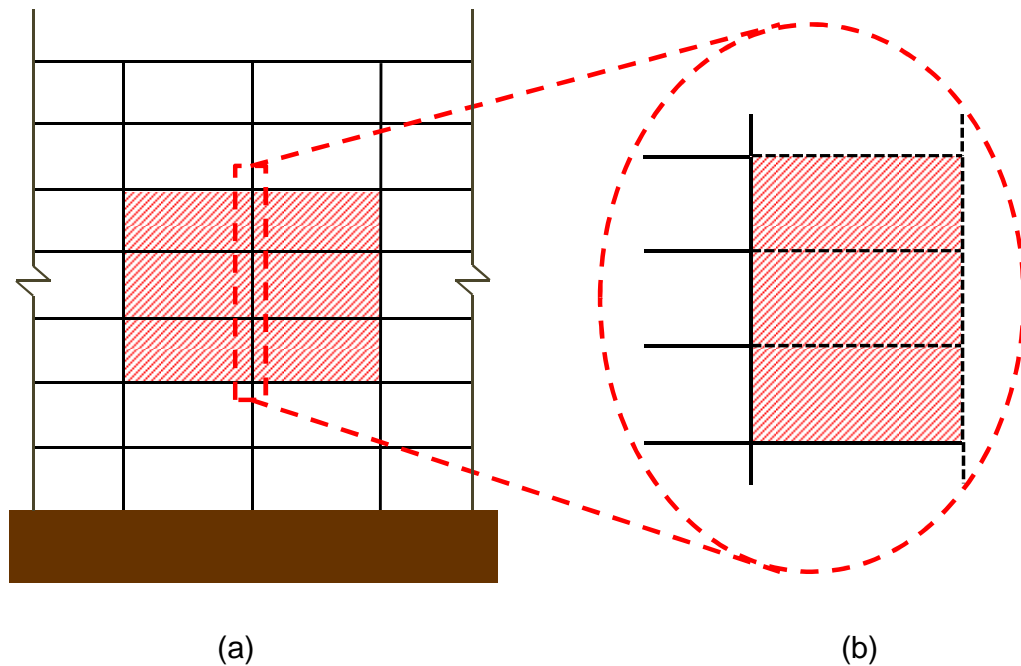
(a) Partial elevation of the building showing three potential fire floors with red hatching, (b) Partial cross section with the structural members to be analysed shown with broken lines.
